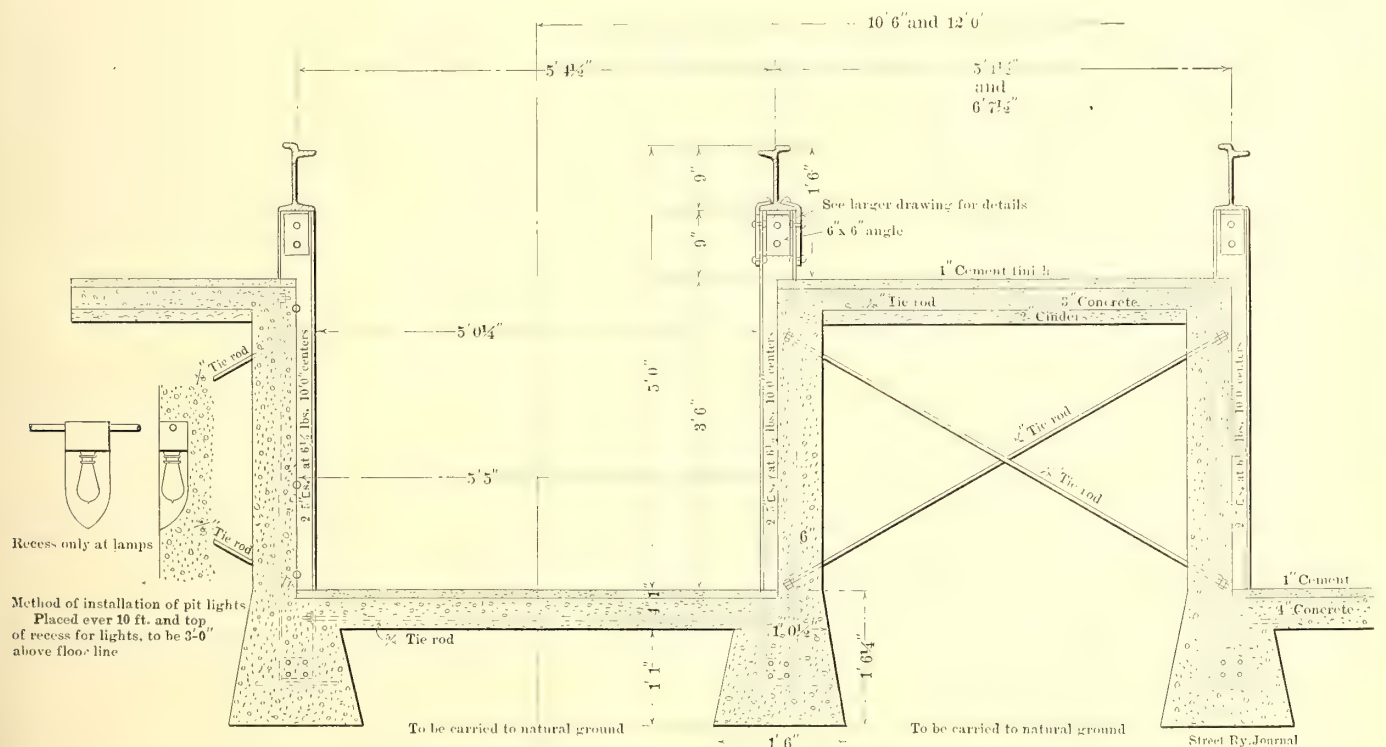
SECTION THROUGH PIT WITH DEPRESSED AISLES
